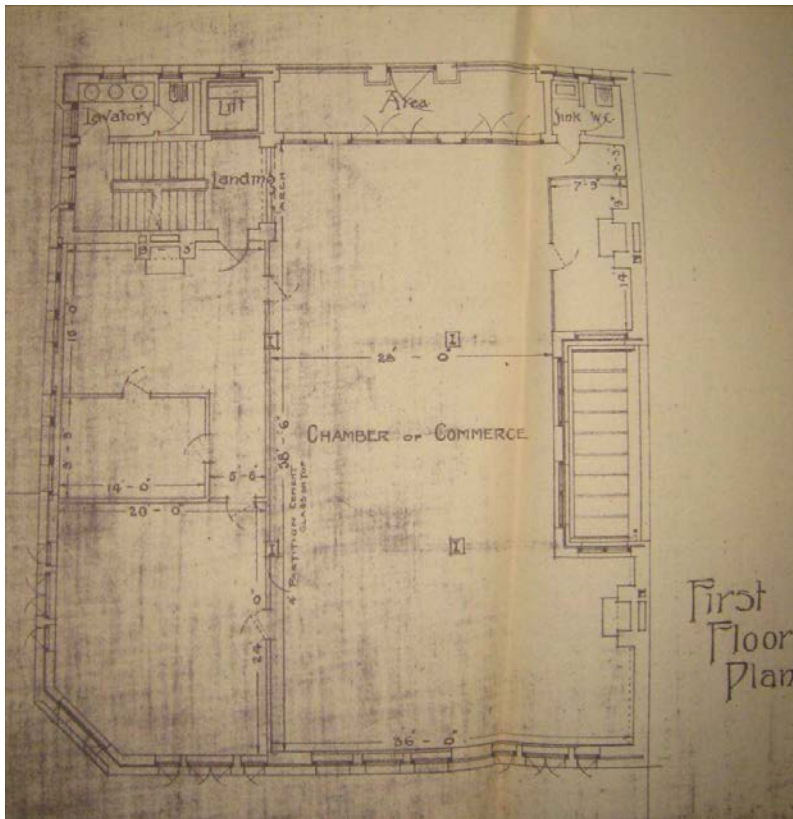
First Floor Plan; the floor was initially occupied by the Chamber of Commerce. Plans indicate that the original building featured a light well on the north side, where the building adjoins the Commercial Building.
